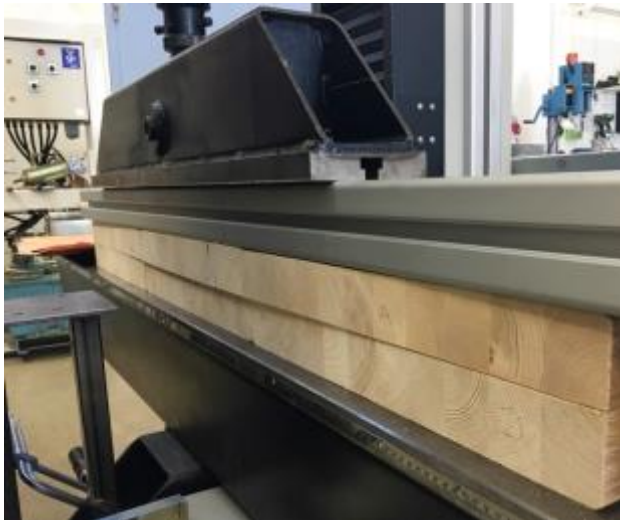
1485 mm long glulam with electrode in between is tested in the universal testing machine.
